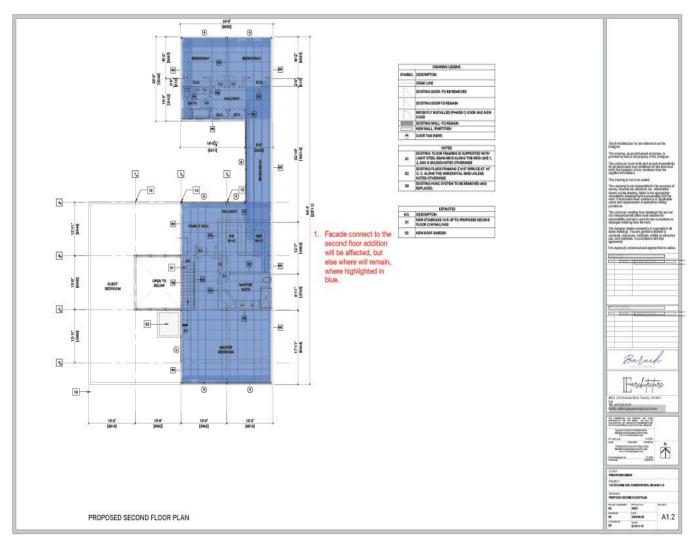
Proposed second floor plan (E-Architecture Inc., 2024)
